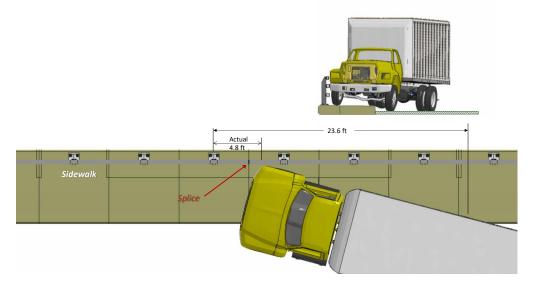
Impact point with bridge rail for Test 4-12 on the sidewalk-mounted S3-TL4. For the sidewalk-mounted system, two (2) analysis cases were performed for Test 4-12:
